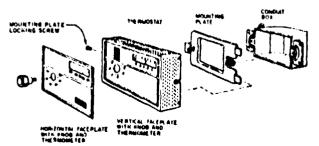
Line drawing illustrating method of mounting a vertical thermostat to a horizontal outlet box and installing a horizontal focapitate.
